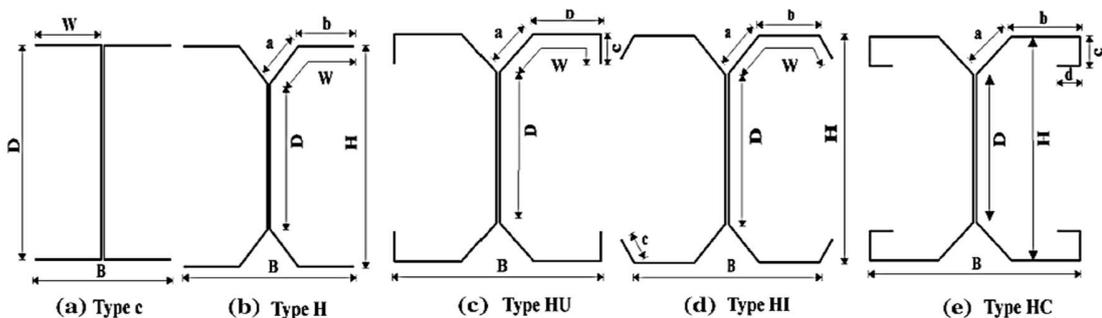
Cross-sections of the tested beams by Manikandan P (2014). [11]
